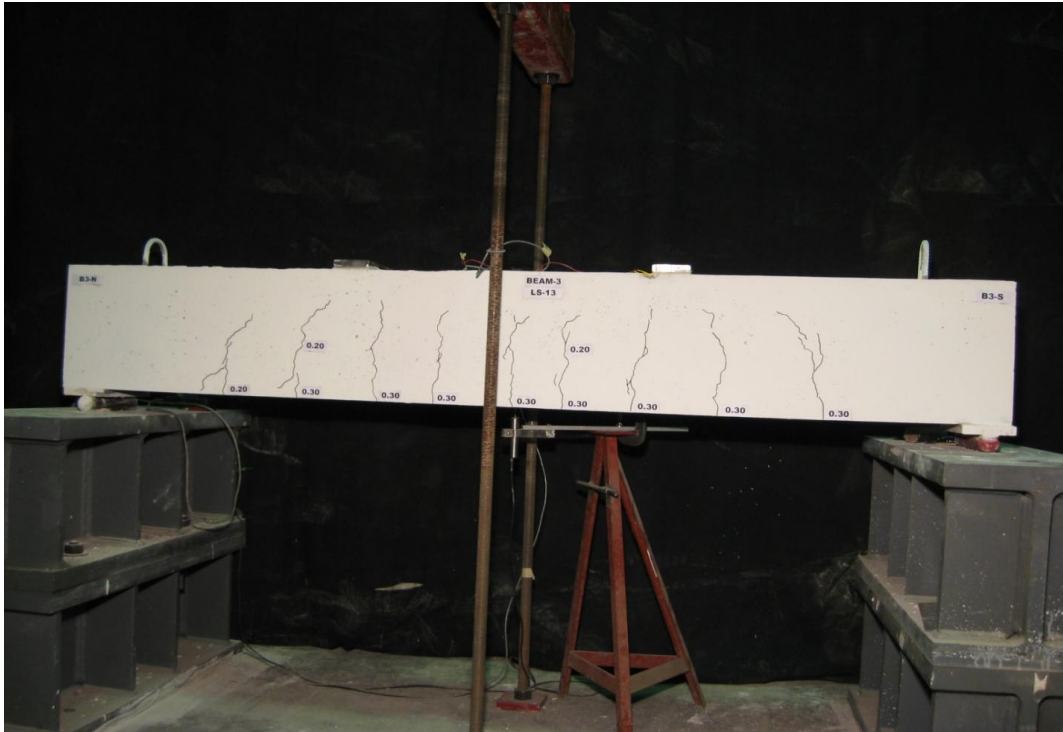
Cracking pattern for beam 3 at a load of 111.6 kN (B3-LS13)
